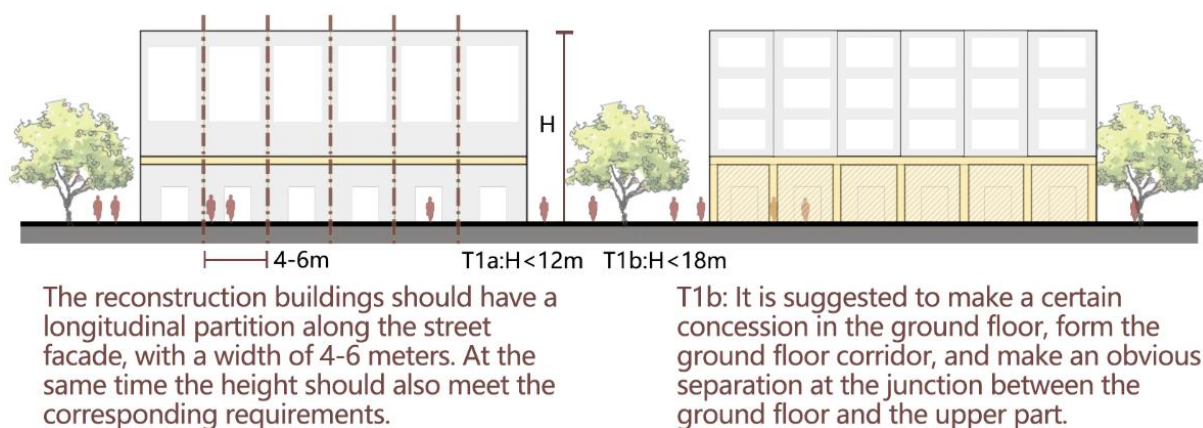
T1 Façade detailed control guidelines (Source: the author)
